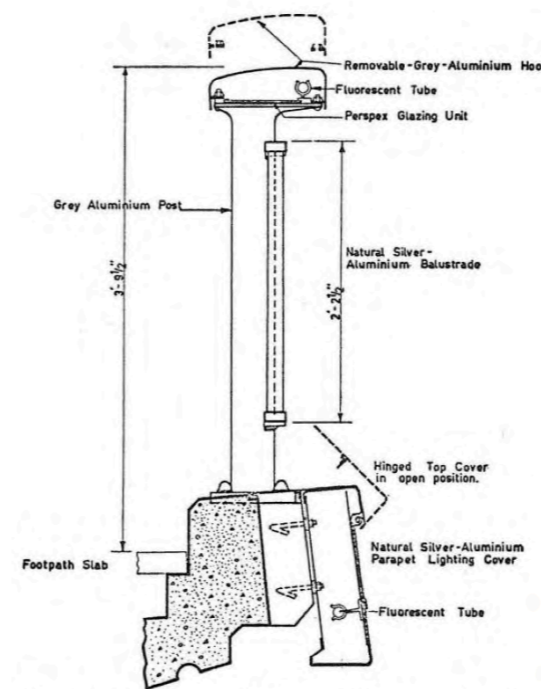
Commonwealth Avenue Bridge handrail and parapet lighting design. (Source: Birkett 1964 p 147)
